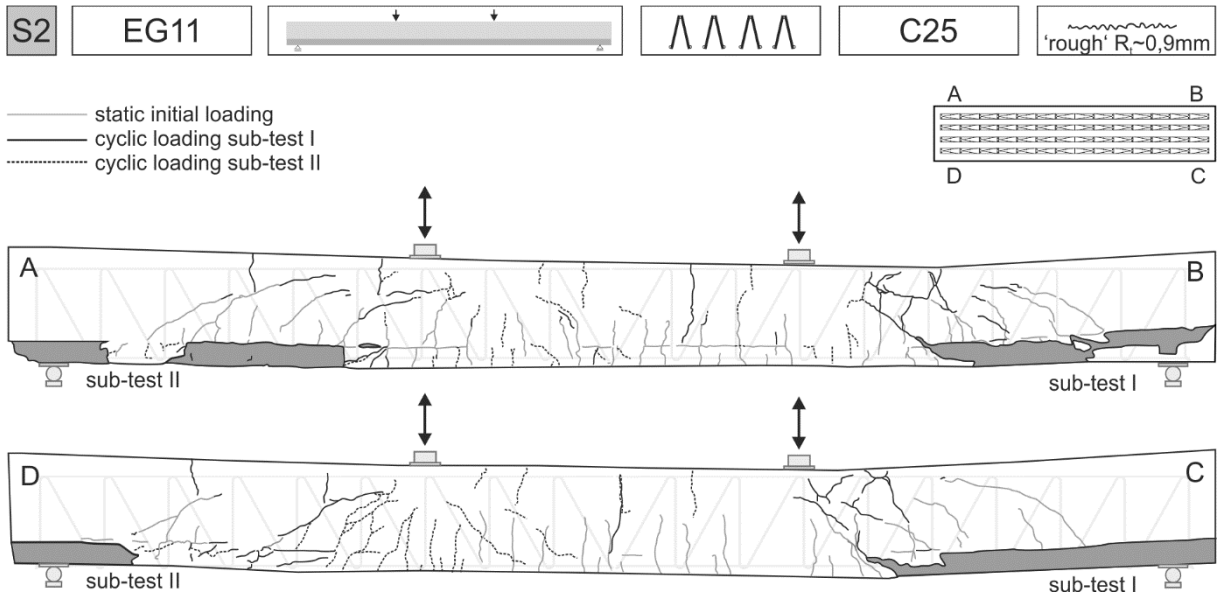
Test parameters, crack patterns and lattice girder fractures of specimen EG11
